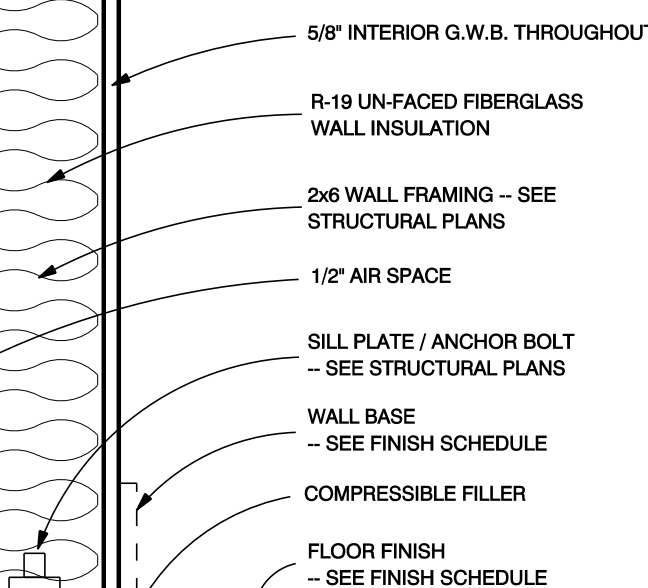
DETAILS AND NOTES AS PER BRICK INDUSTRY ASSOCIATION TECHNICAL NOTES ON BRICK CONSTRUCTION DOCUMENT 21-B
